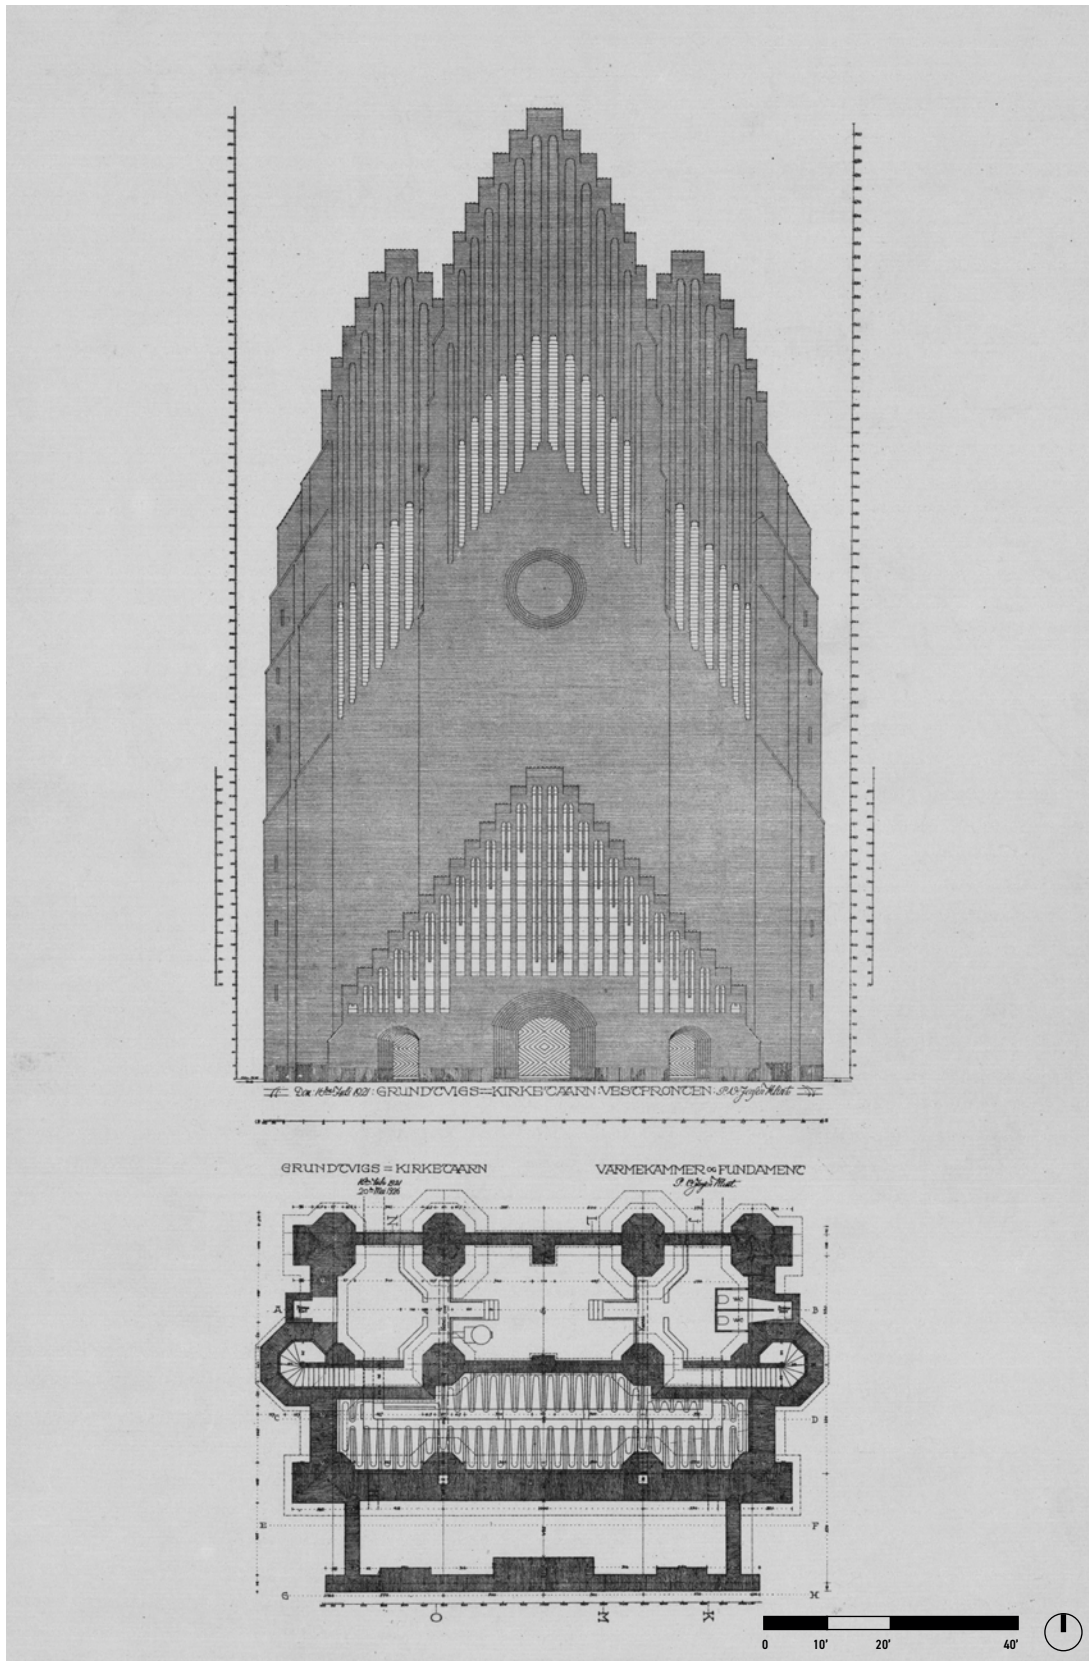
P.V. Jensen-Klint, plan and elevation, Grundtvig's Church, Copenhagen, 1940. Drawing by P.V. Jensen-Klint, shows every course on facade, 1921.¹¹
